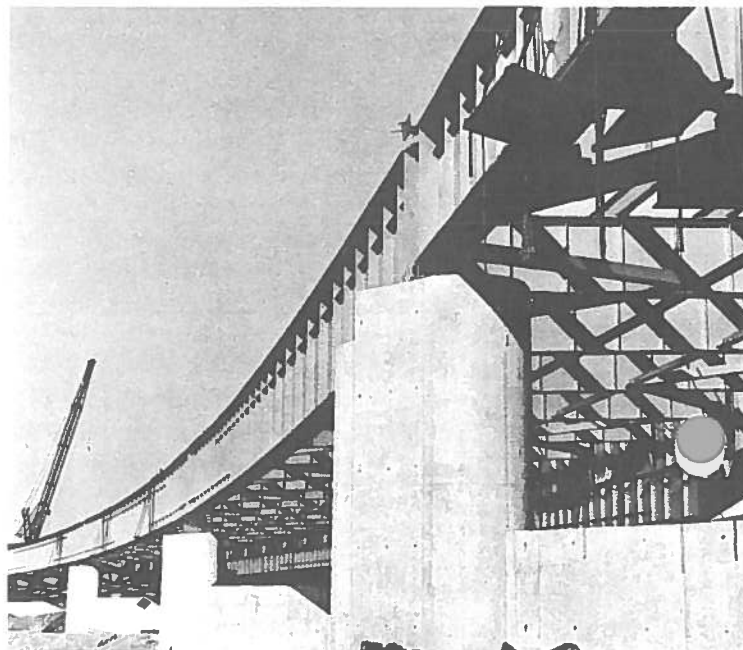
COMPOSITE PLATE GIRDER BRIDGE,
